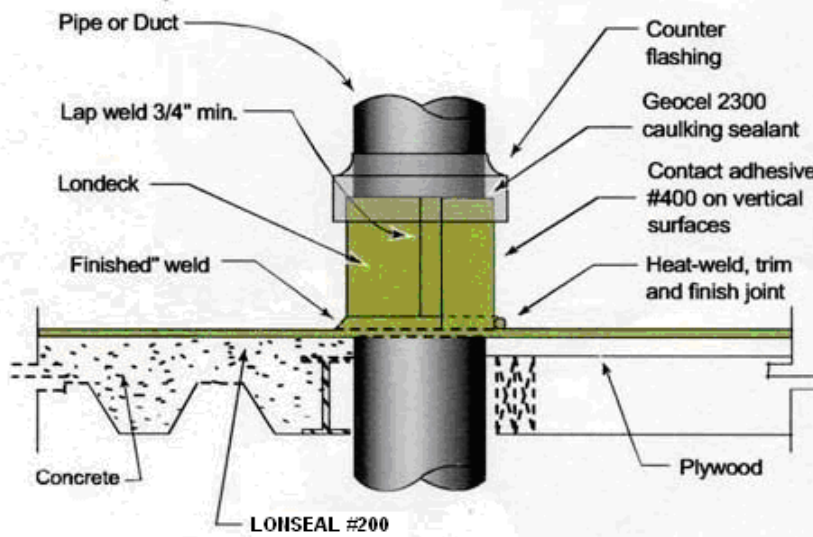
Pipe or Duct Detail Through Wood or Concrete
